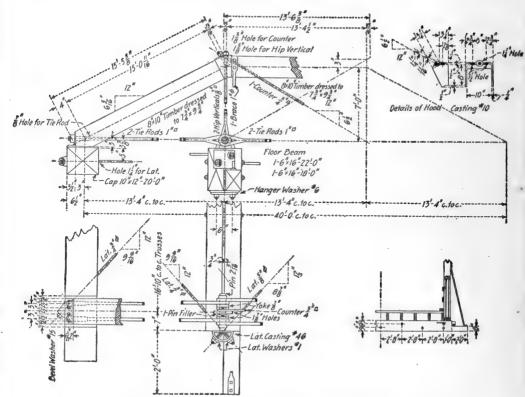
DETAILS OF HIGHWAY CROSSING. ILLINOIS CENTRAL RAILROAD.
